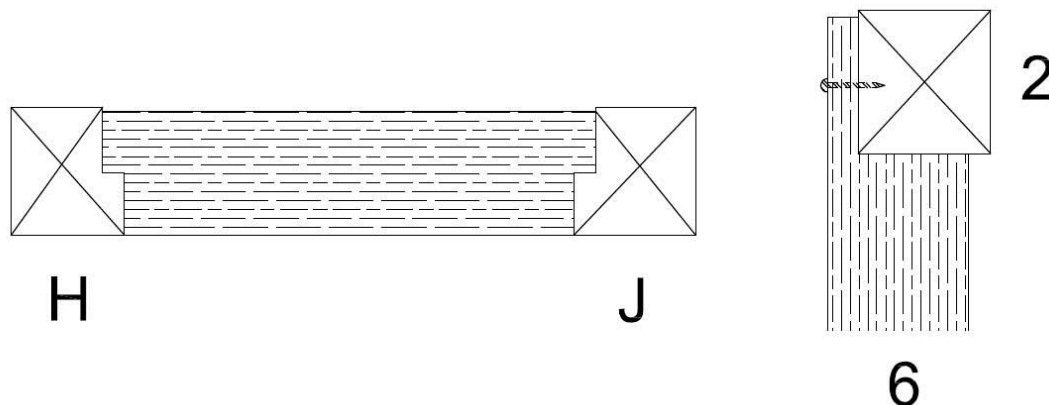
Illustration of connecting member (Left), principle of fixation of primary beam to column (Right).
